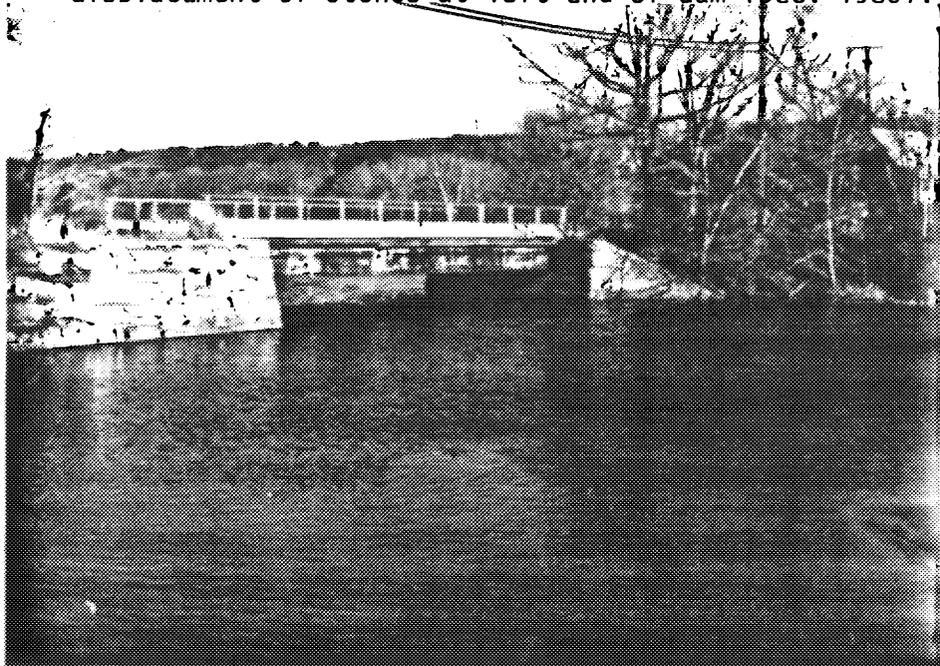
Embankment and opening at road just upstream from dam (Dec. 1980).
